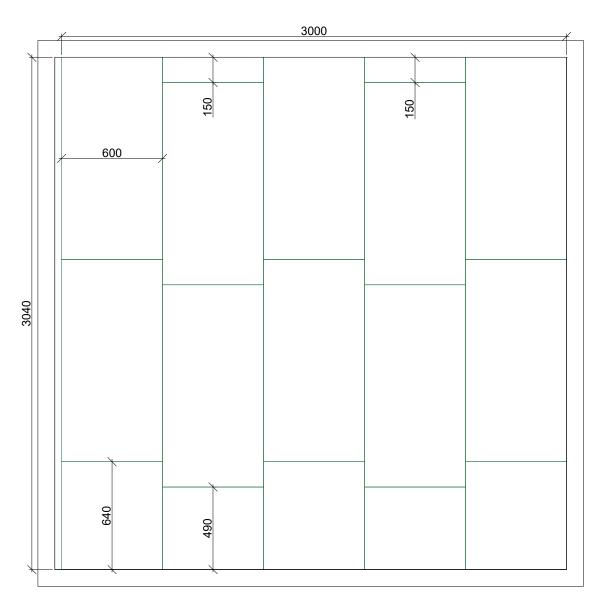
Layout of Insulation viewed from the exposed surface of the test construction
